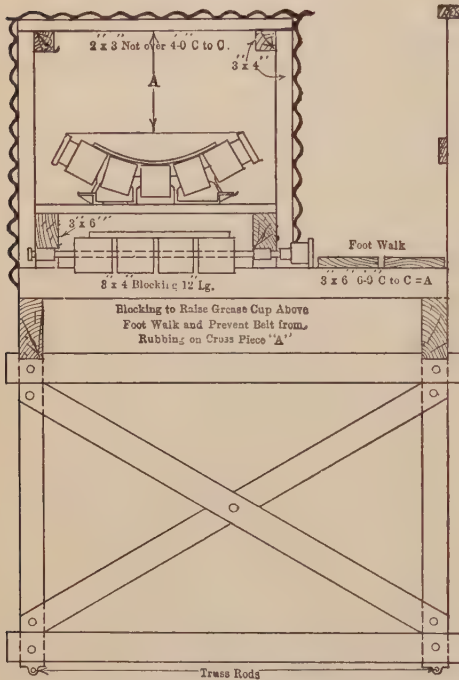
Enclosure for Belt Conveyor, Corrugated Steel on Wood Frame. (R. H. Beaumont Co.)
